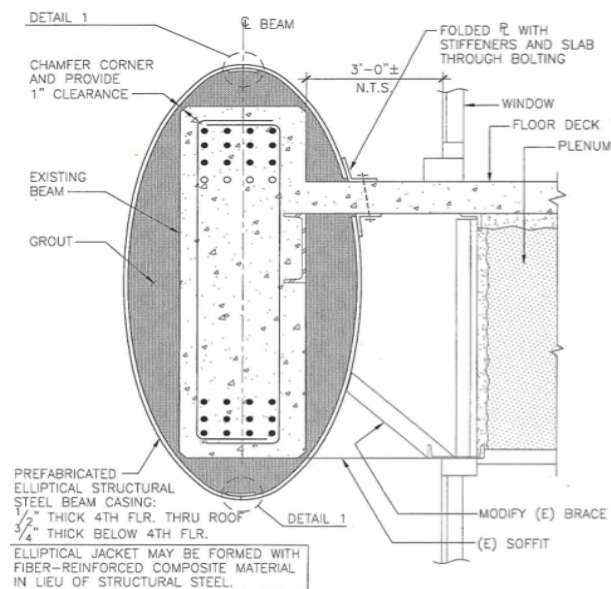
A typical Section of Elliptical Steel Jacket Encasement.
